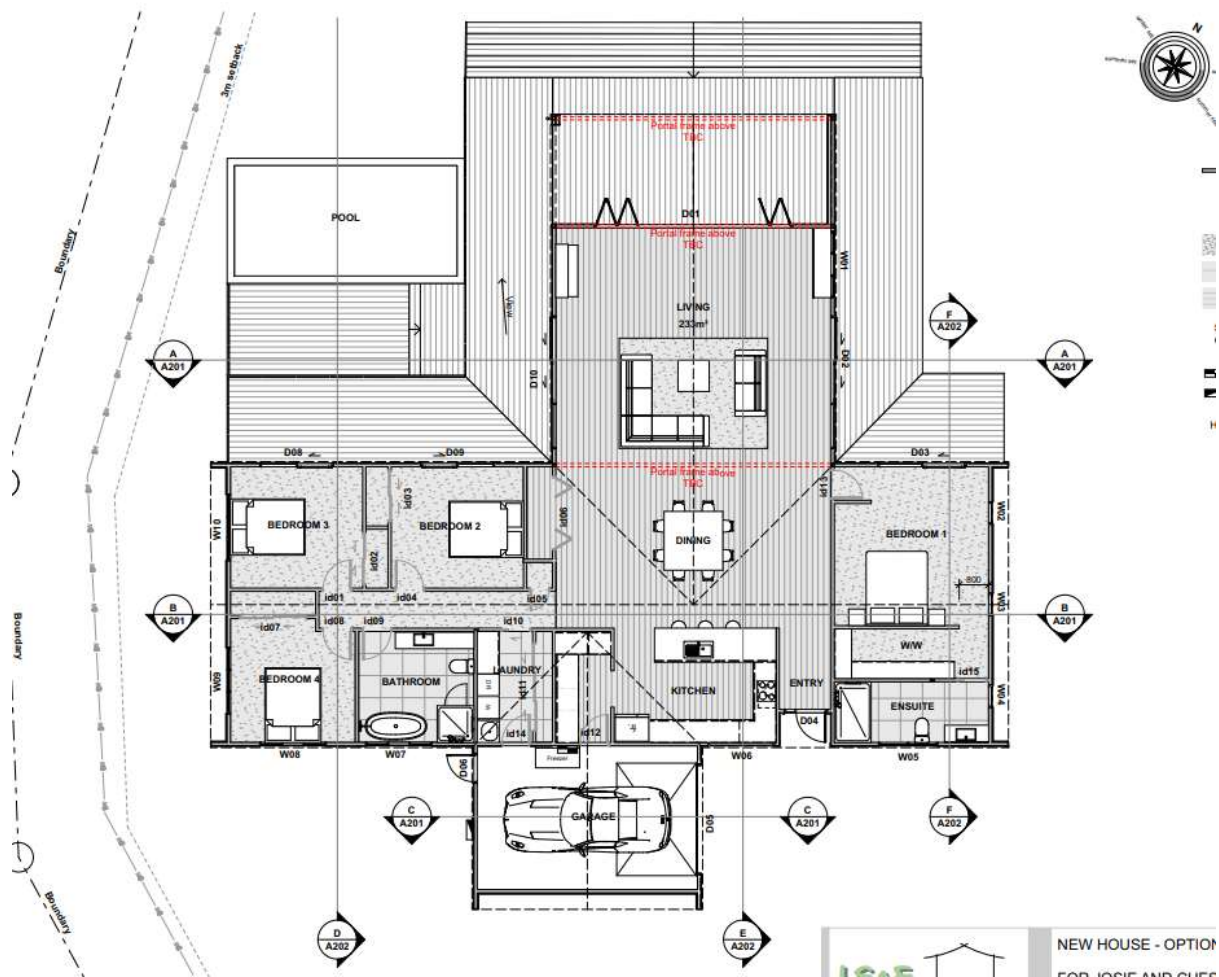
Proposed floor plan (Leaf Architecture NZ)
